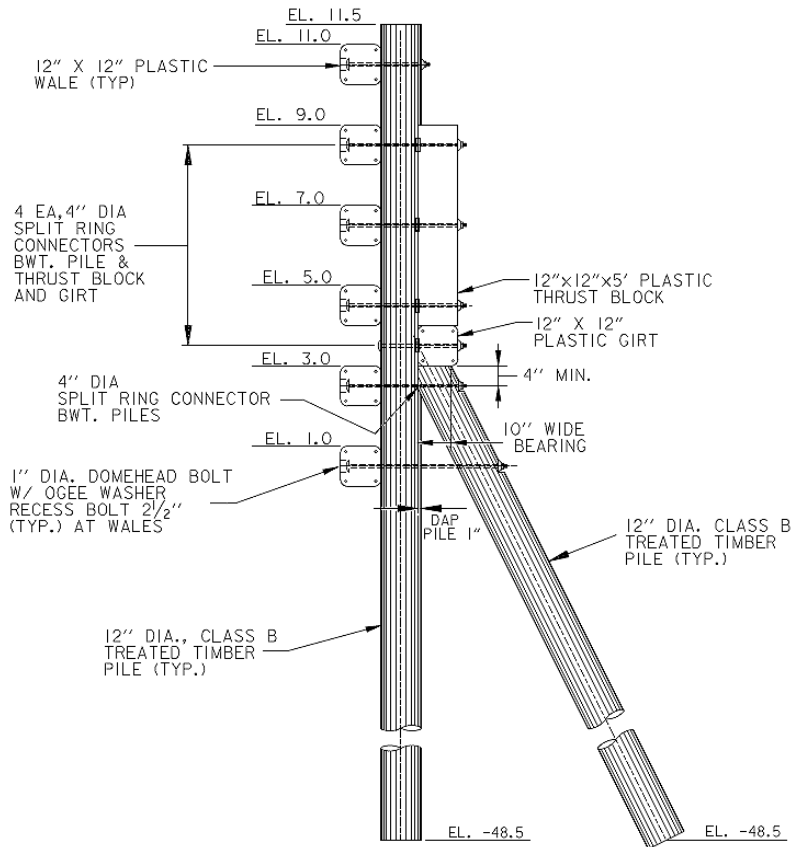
Cross section of flexible timber guide wall used in Catfish Point structure 2 (from plans titled ‘Catfish Point Control Structure: North and South Guidewalls Replacement’ dated 2005, USACE)
